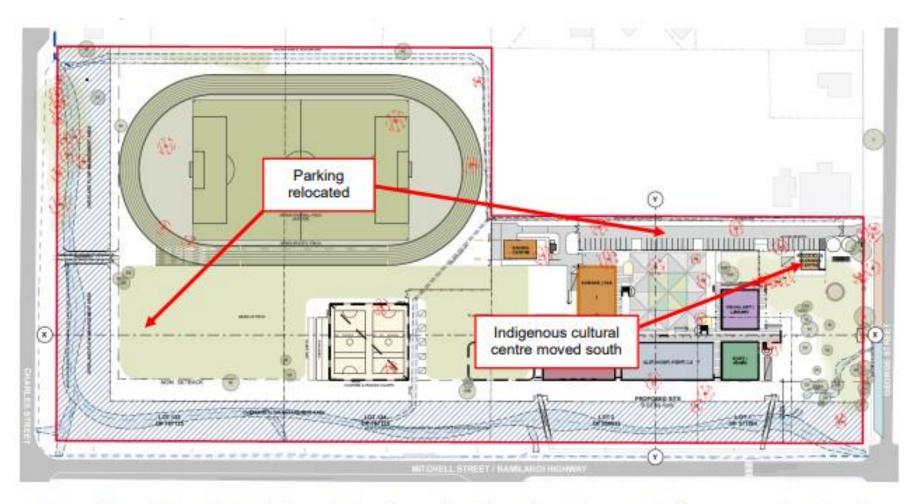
Amended site layout showing relocation of parking and Indigenous cultural centre
